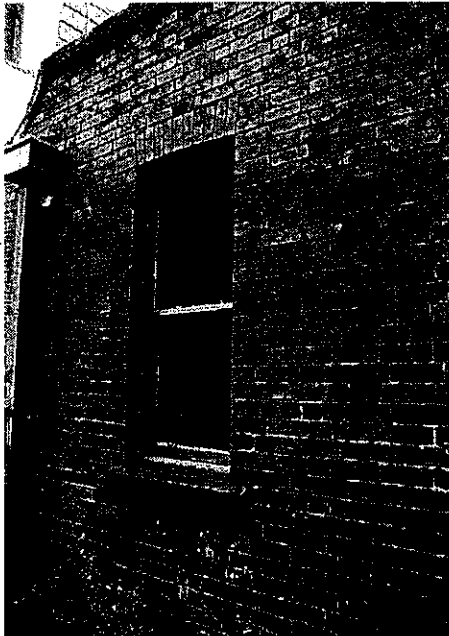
Exterior, Office & Toilet Wing, part west elevation (north end) showing early timber framed double hung window with early bluestone sill.
